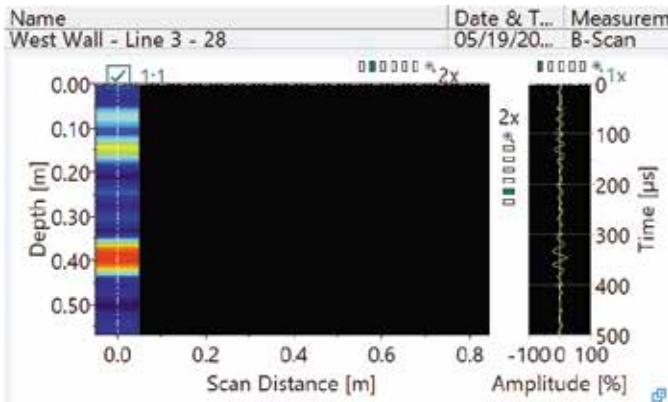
Ultrasonic pulse echo analysis of concrete where lap detail and waterproofing adhesion failure were found.
